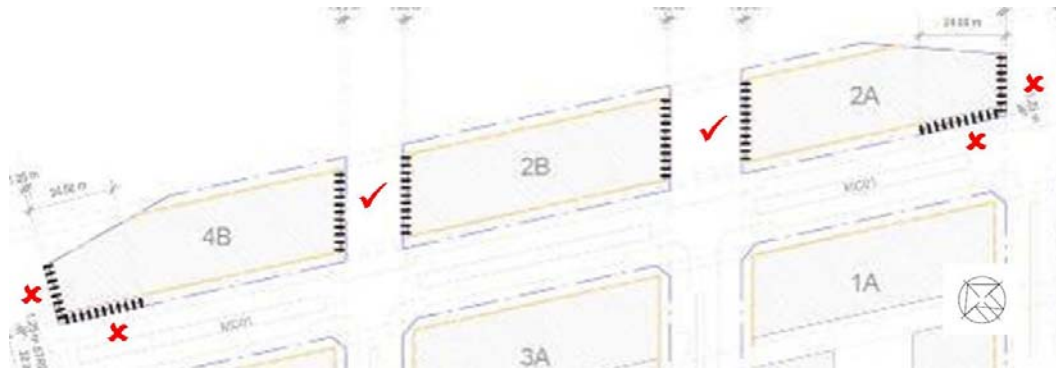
The hatching shows where buildings are proposed to maintain the 1.25m lower level setback only and not be set back 3m.
